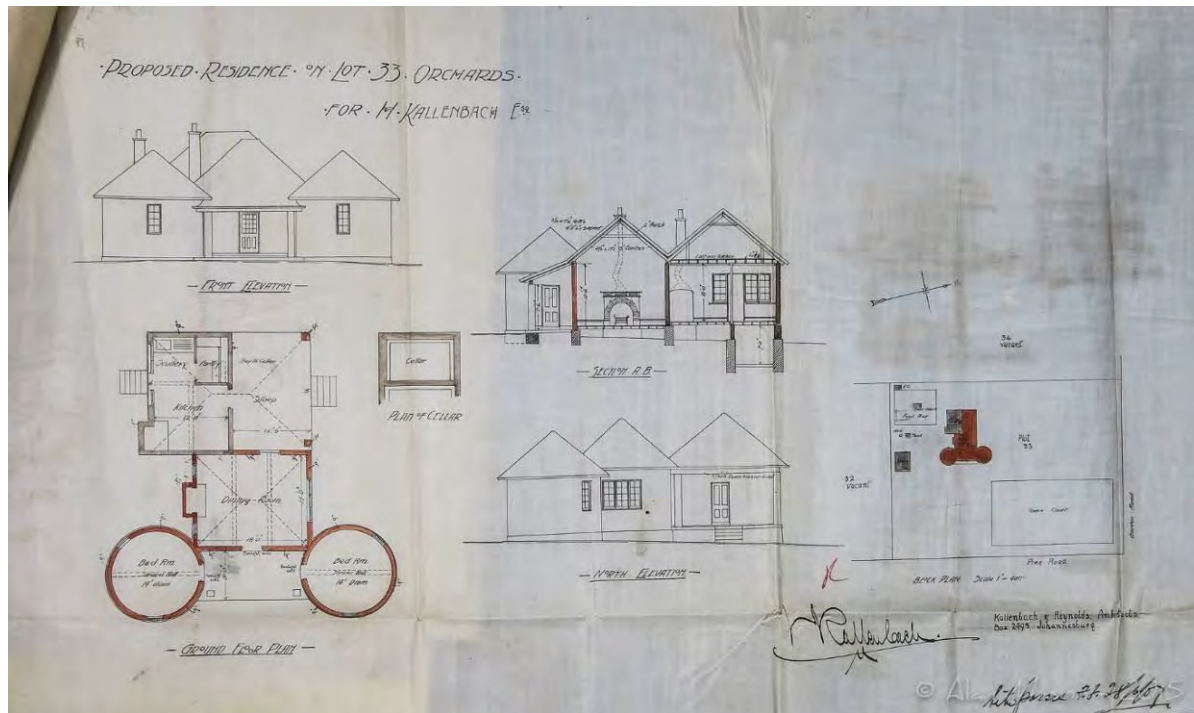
Plan for proposed residences on Stand 33 (now Stand 2/250)
